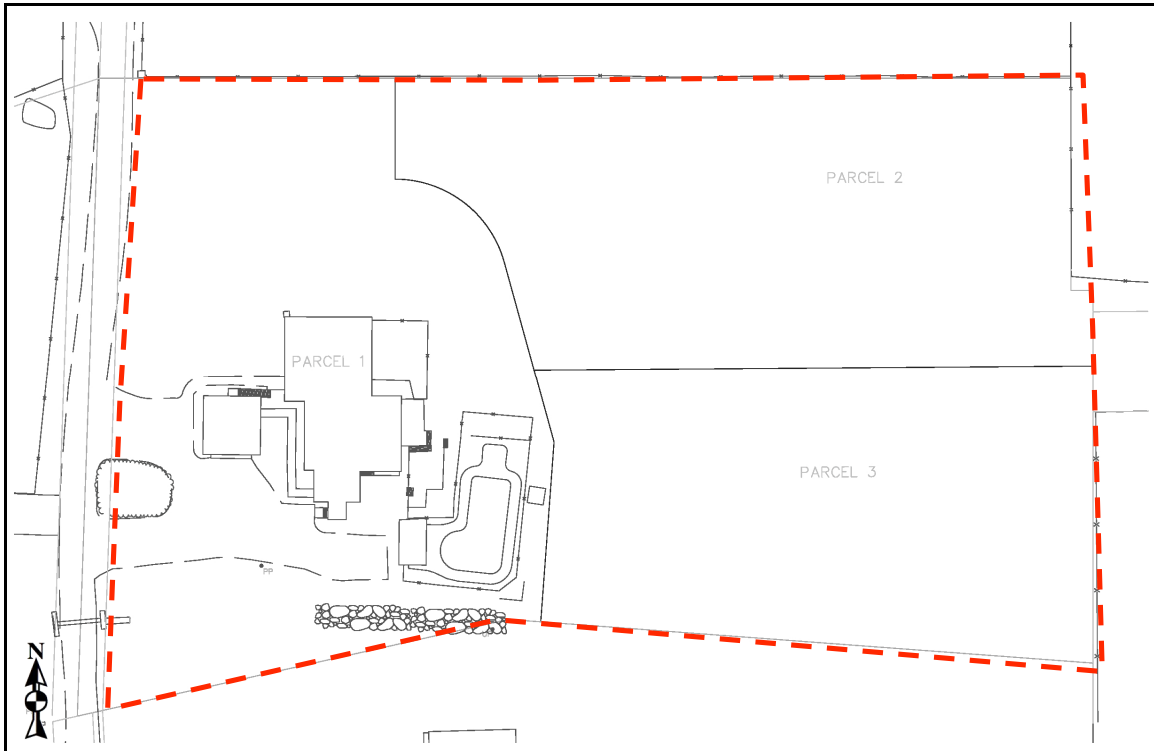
Proposed Site Plan (Snipes-Dye Associates 2005)
